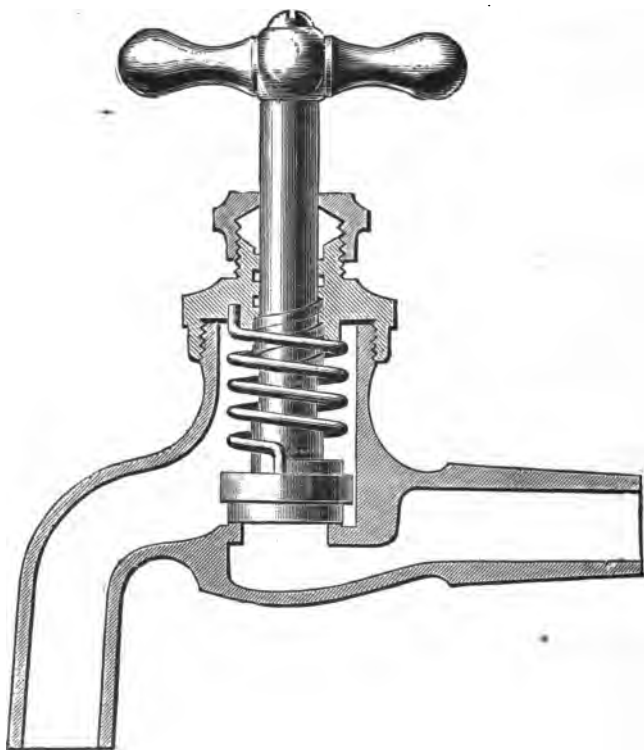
Sectional view of a Self-closing Bibb.
